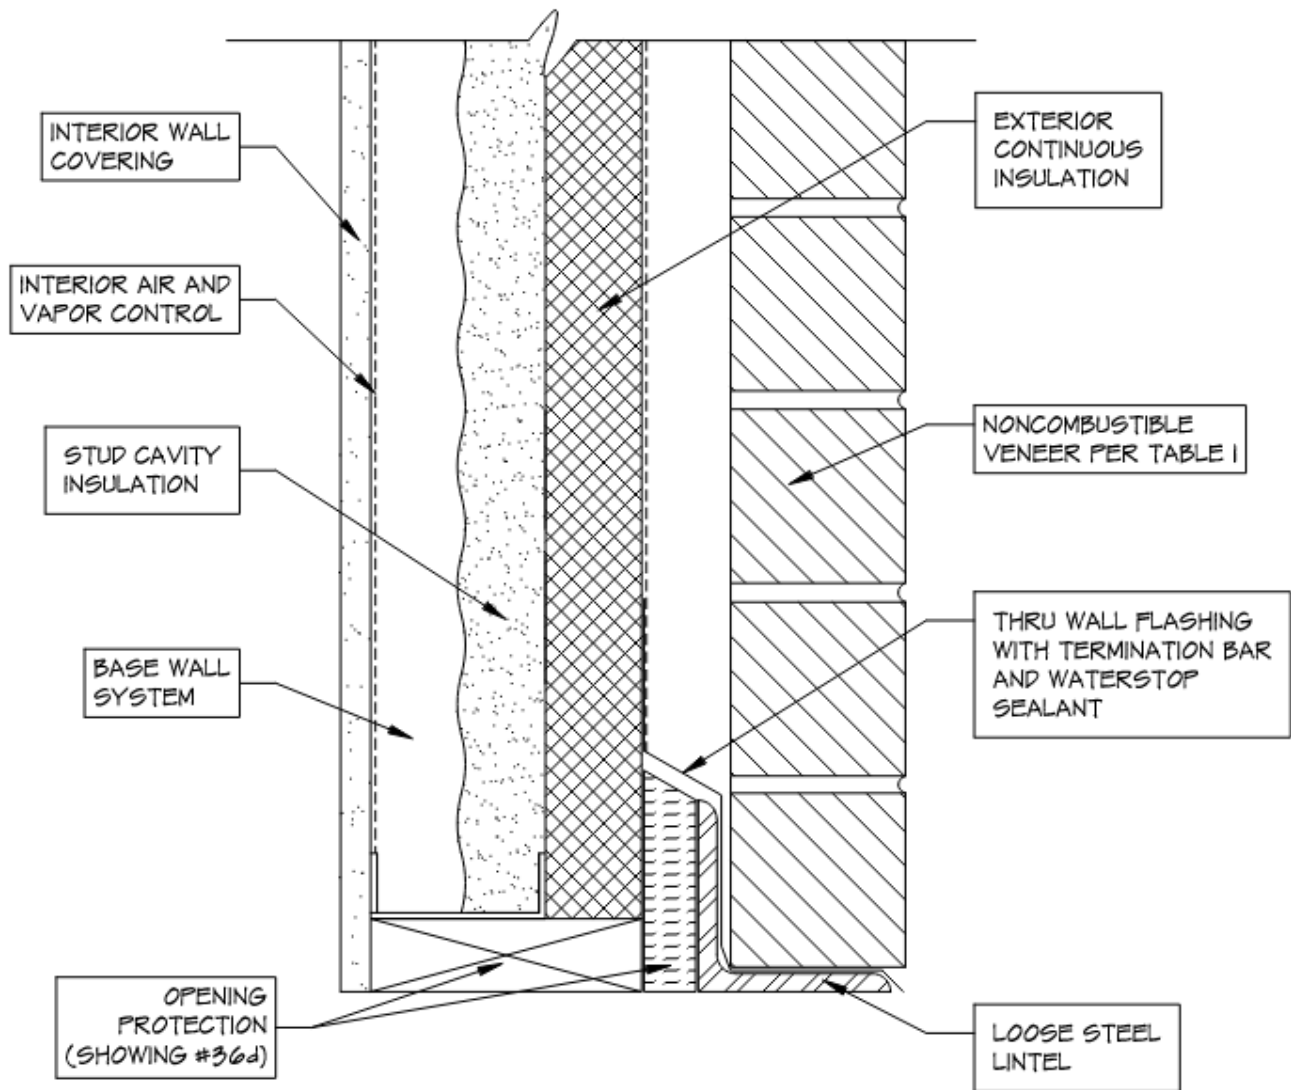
Exterior Wall Construction – Thermax and ccSPF Spray Foam
